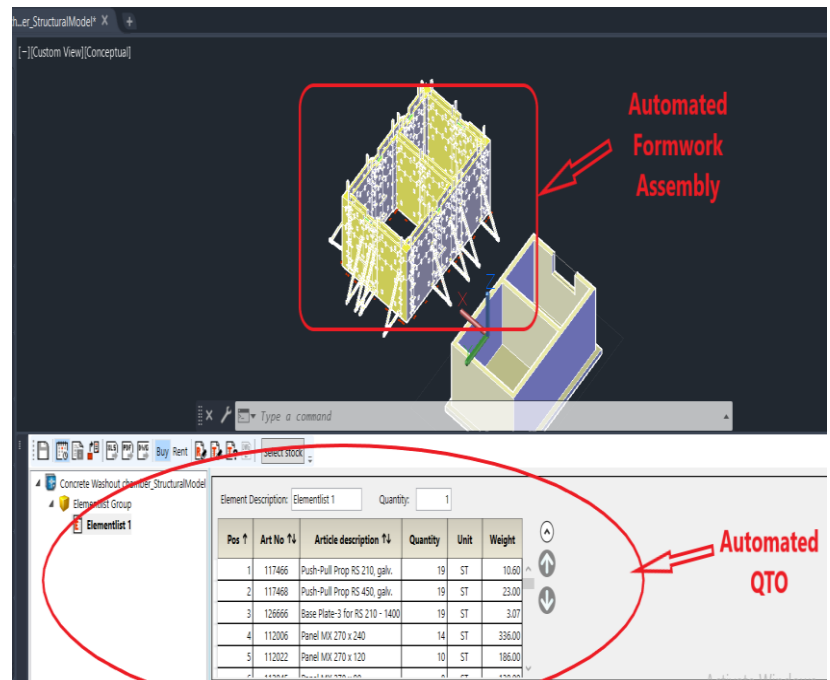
Formwork Automated Assembly and QTO in Peri CAD
